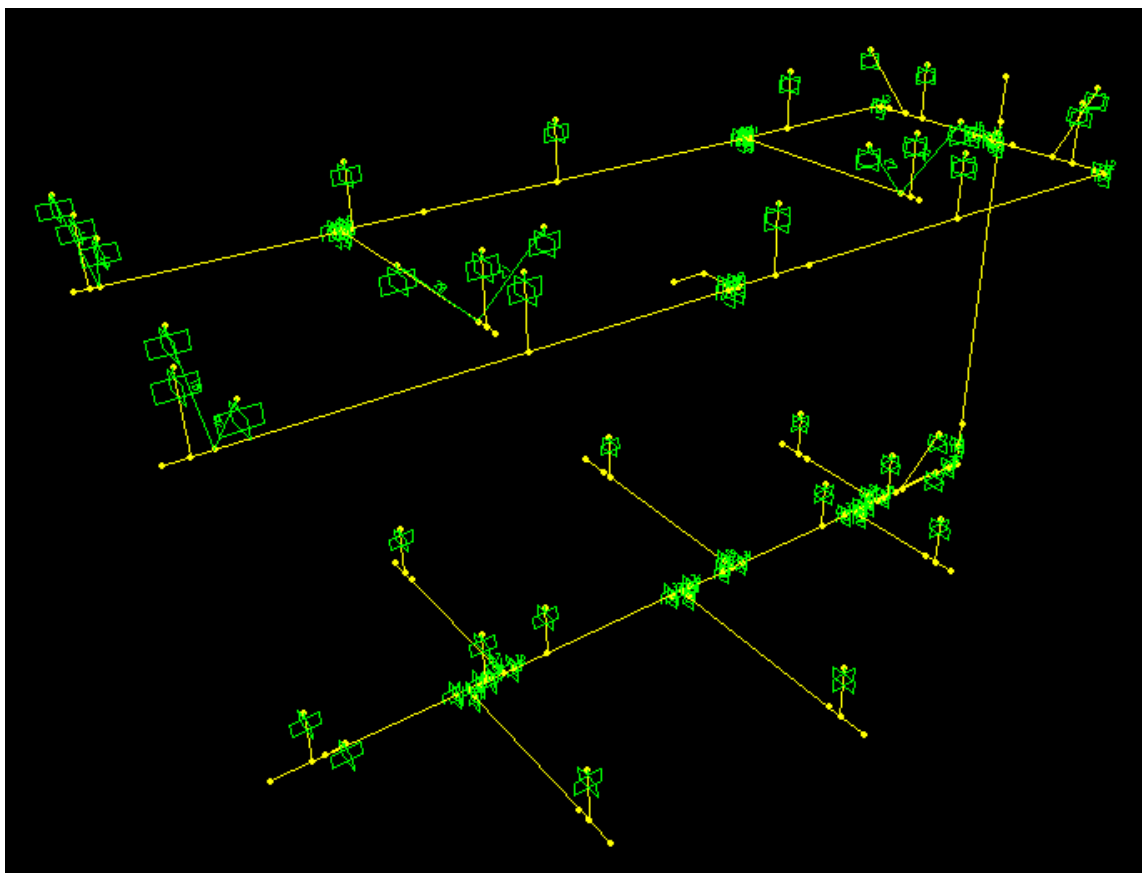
Numerical model of fire sprinkler piping system in SAP2000
